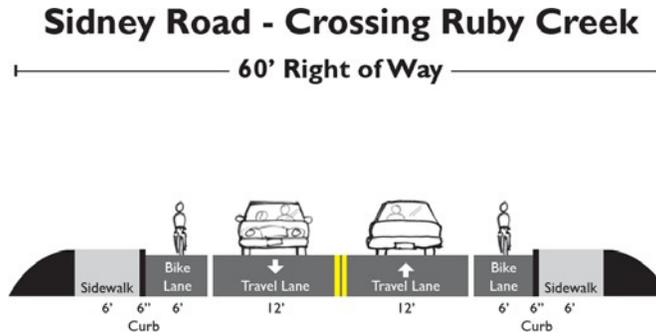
Sidney Road SW. Where Sidney Road SW crosses Ruby Creek, the road will narrow and taper to the above standard. This will minimize impacts to Ruby Creek while providing for nonmotorized connectivity. This section requires culvert replacement.
